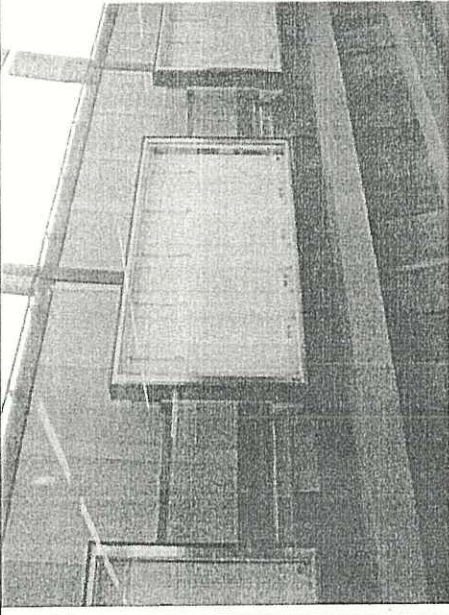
Wind shield along and absorptive parapet wall at KSR
